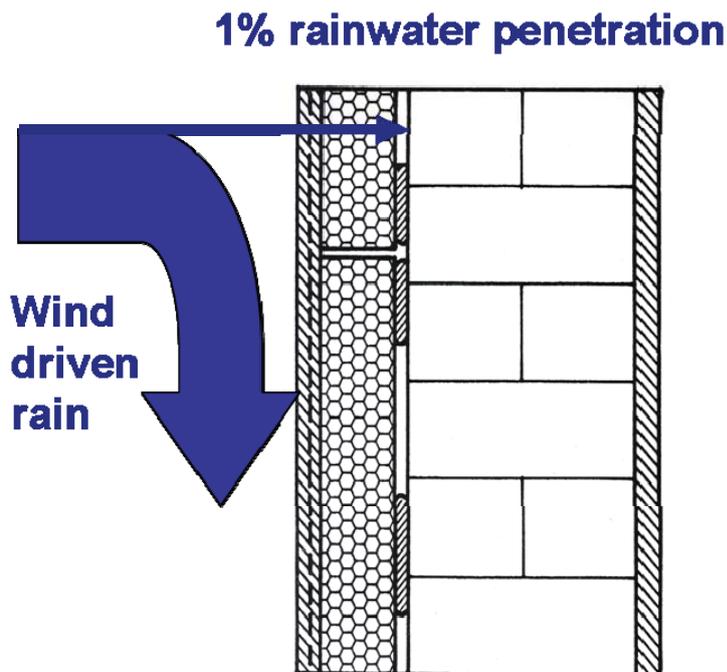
Example that shows the most likely deposit location for rainwater penetrating through leaks at joints and connections of a masonry wall with ETICS
